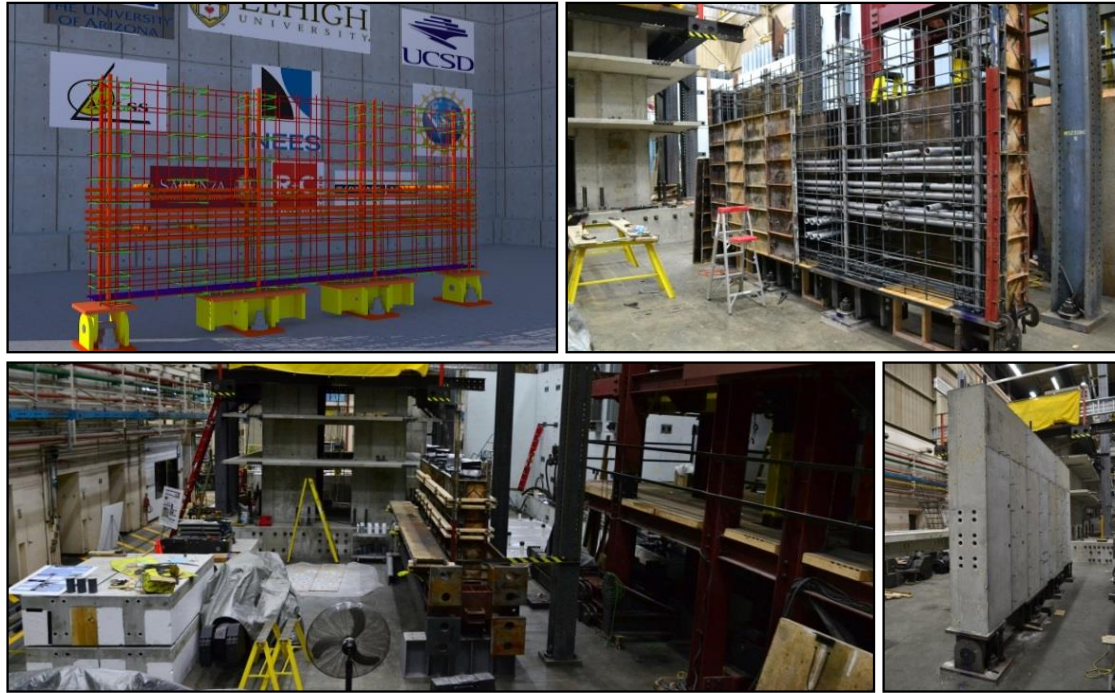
Photos during construction process of reinforced concrete shear wall
